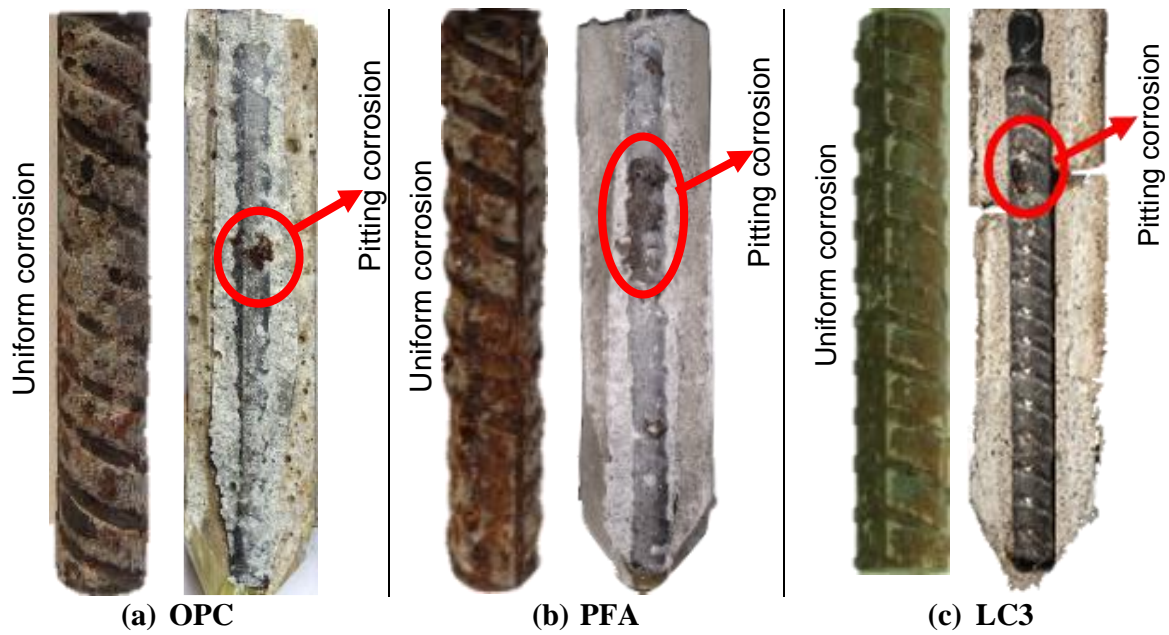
Uniform corrosion (ICC) and pitting corrosion (WDC) observed
